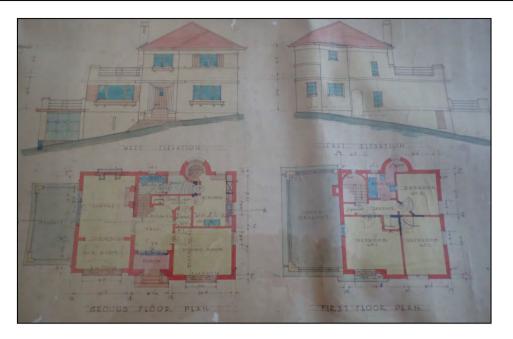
Floor Plans and Elevations designed by John R Brogan (Photo taken 23 April 2021)
